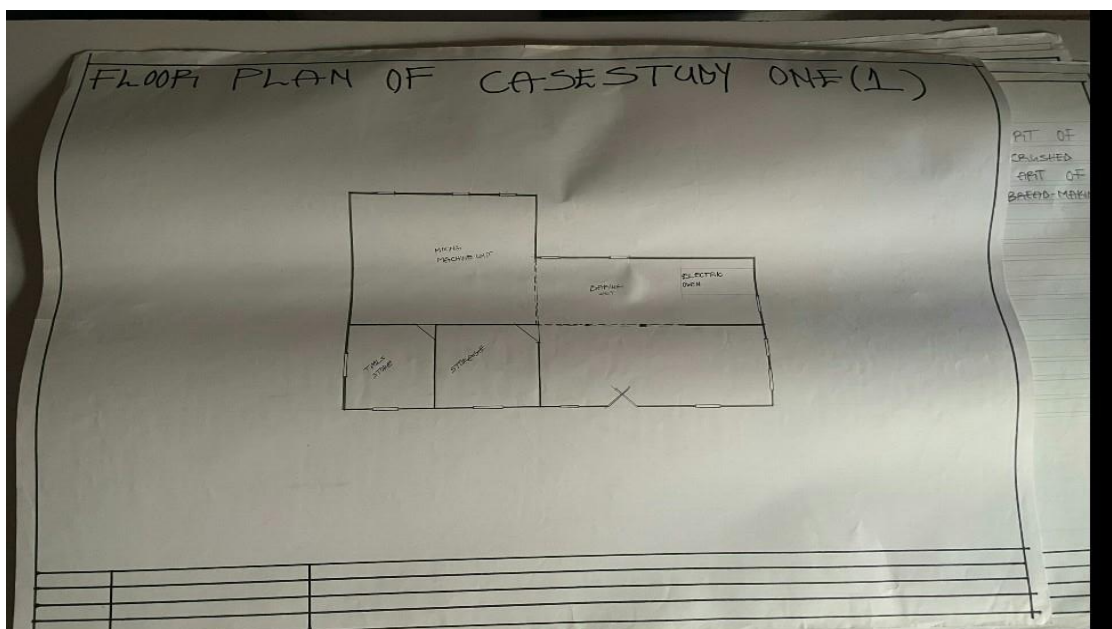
FLOOR PLAN OF CASE STUDY ONE
